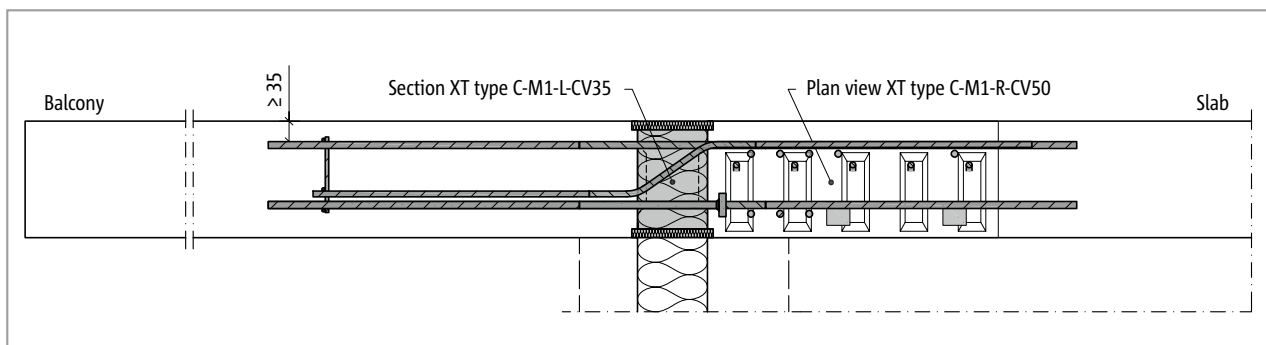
Schöck Isokorb® XT type C: Outer corner with non-load-bearing cavity wall masonry (section XT type C-M1-L-CV35; view XT type C-M1-R-CV50)
